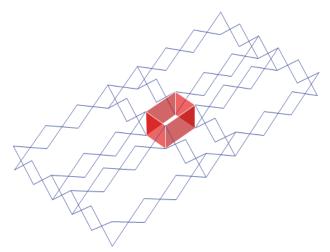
Shear wall and outrigger with belt truss system connected to core shear wall
